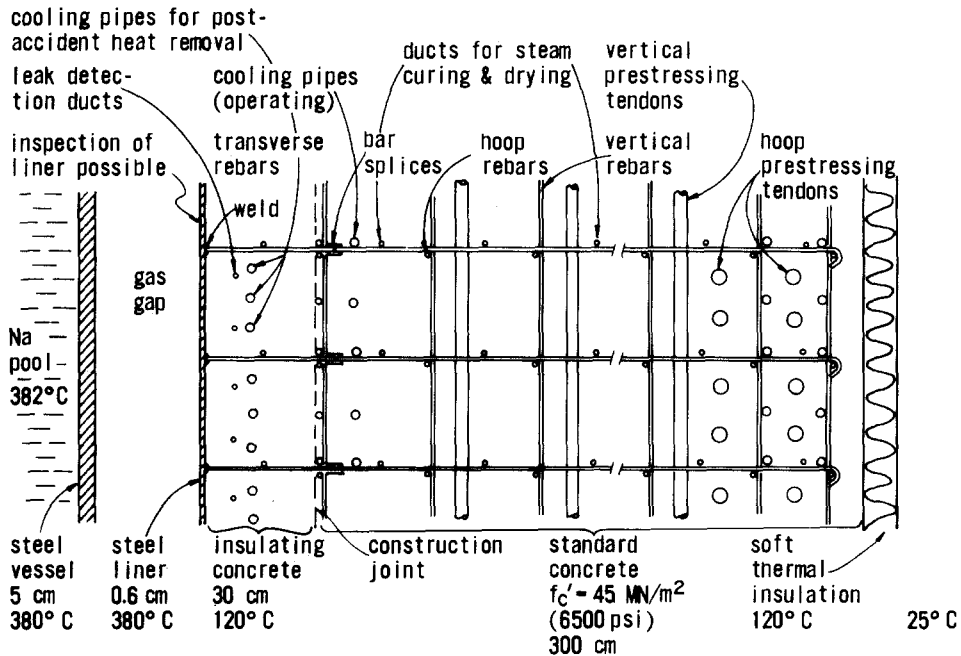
Reinforcement, ducts and pipes within the cross section of wall of the primary containment vessel.
